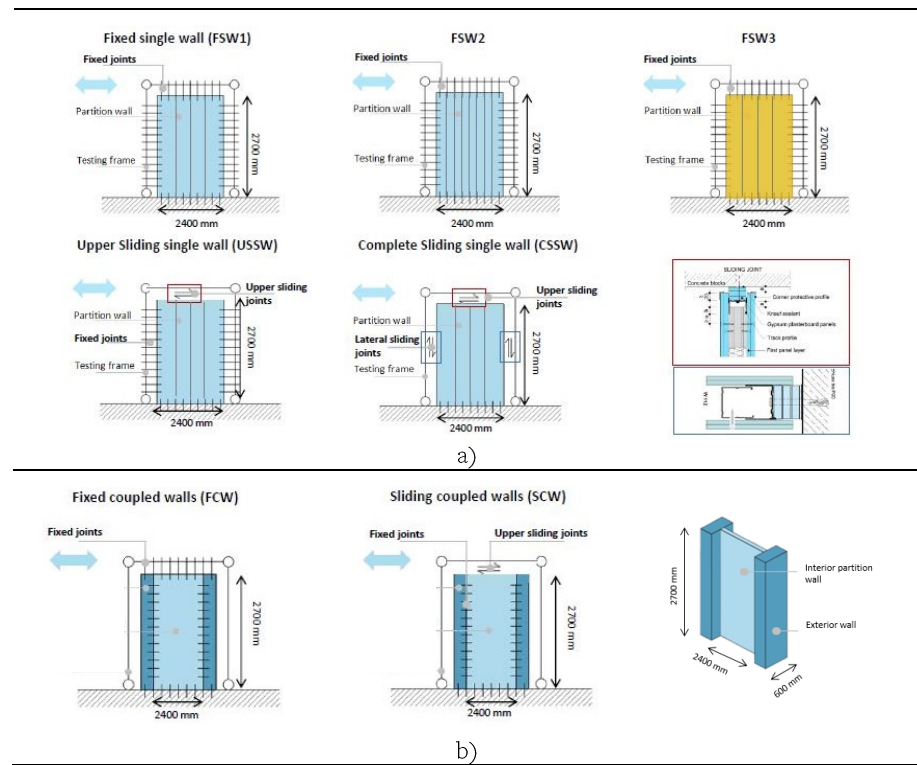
The investigated wall geometrical parameters for: a) single partition wall; b) subsystems
